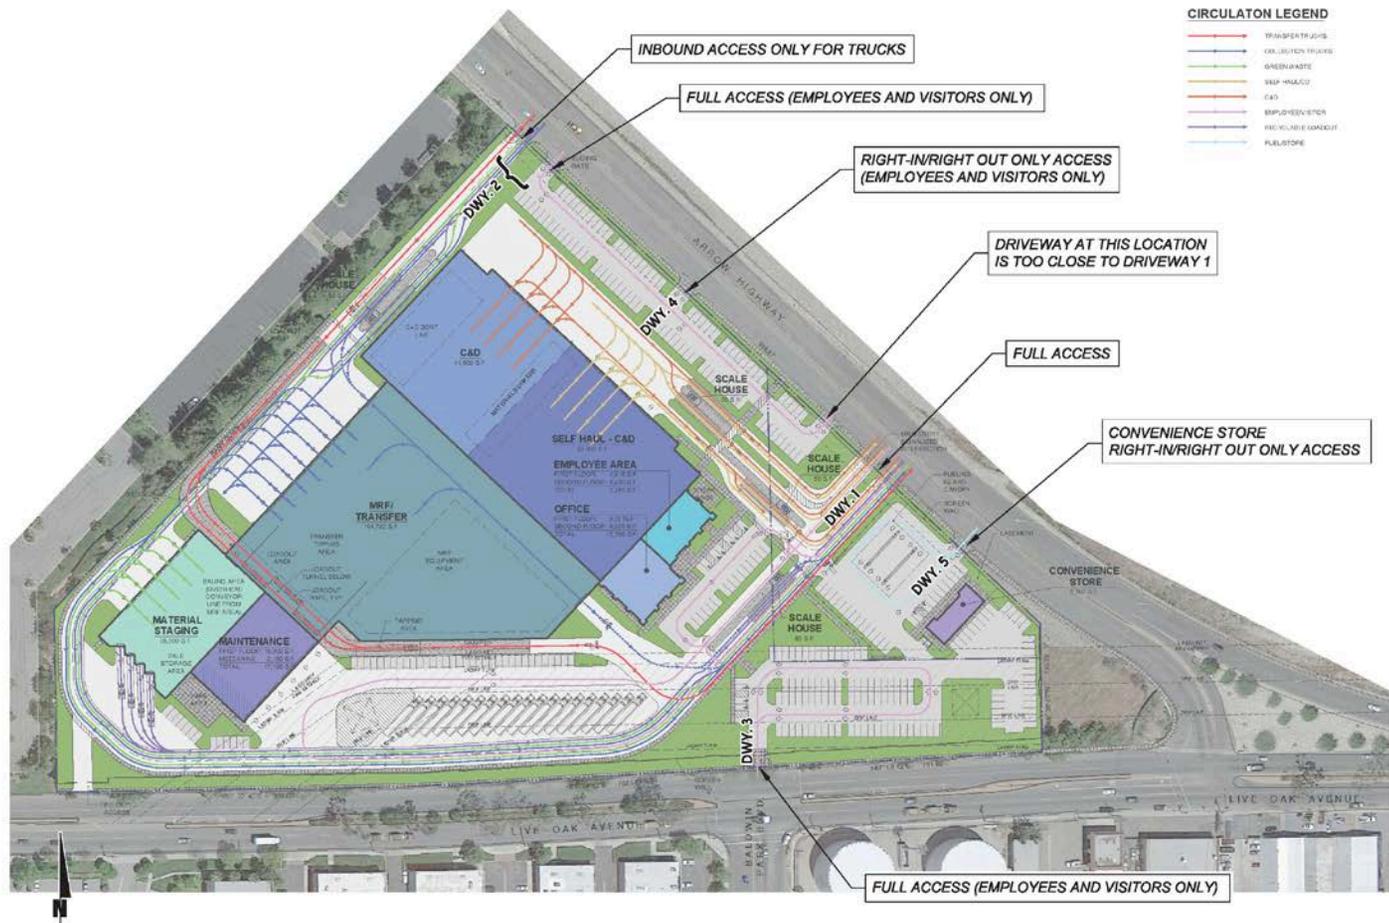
EXHIBIT A: SITE ACCESS RECOMMENDATIONS
